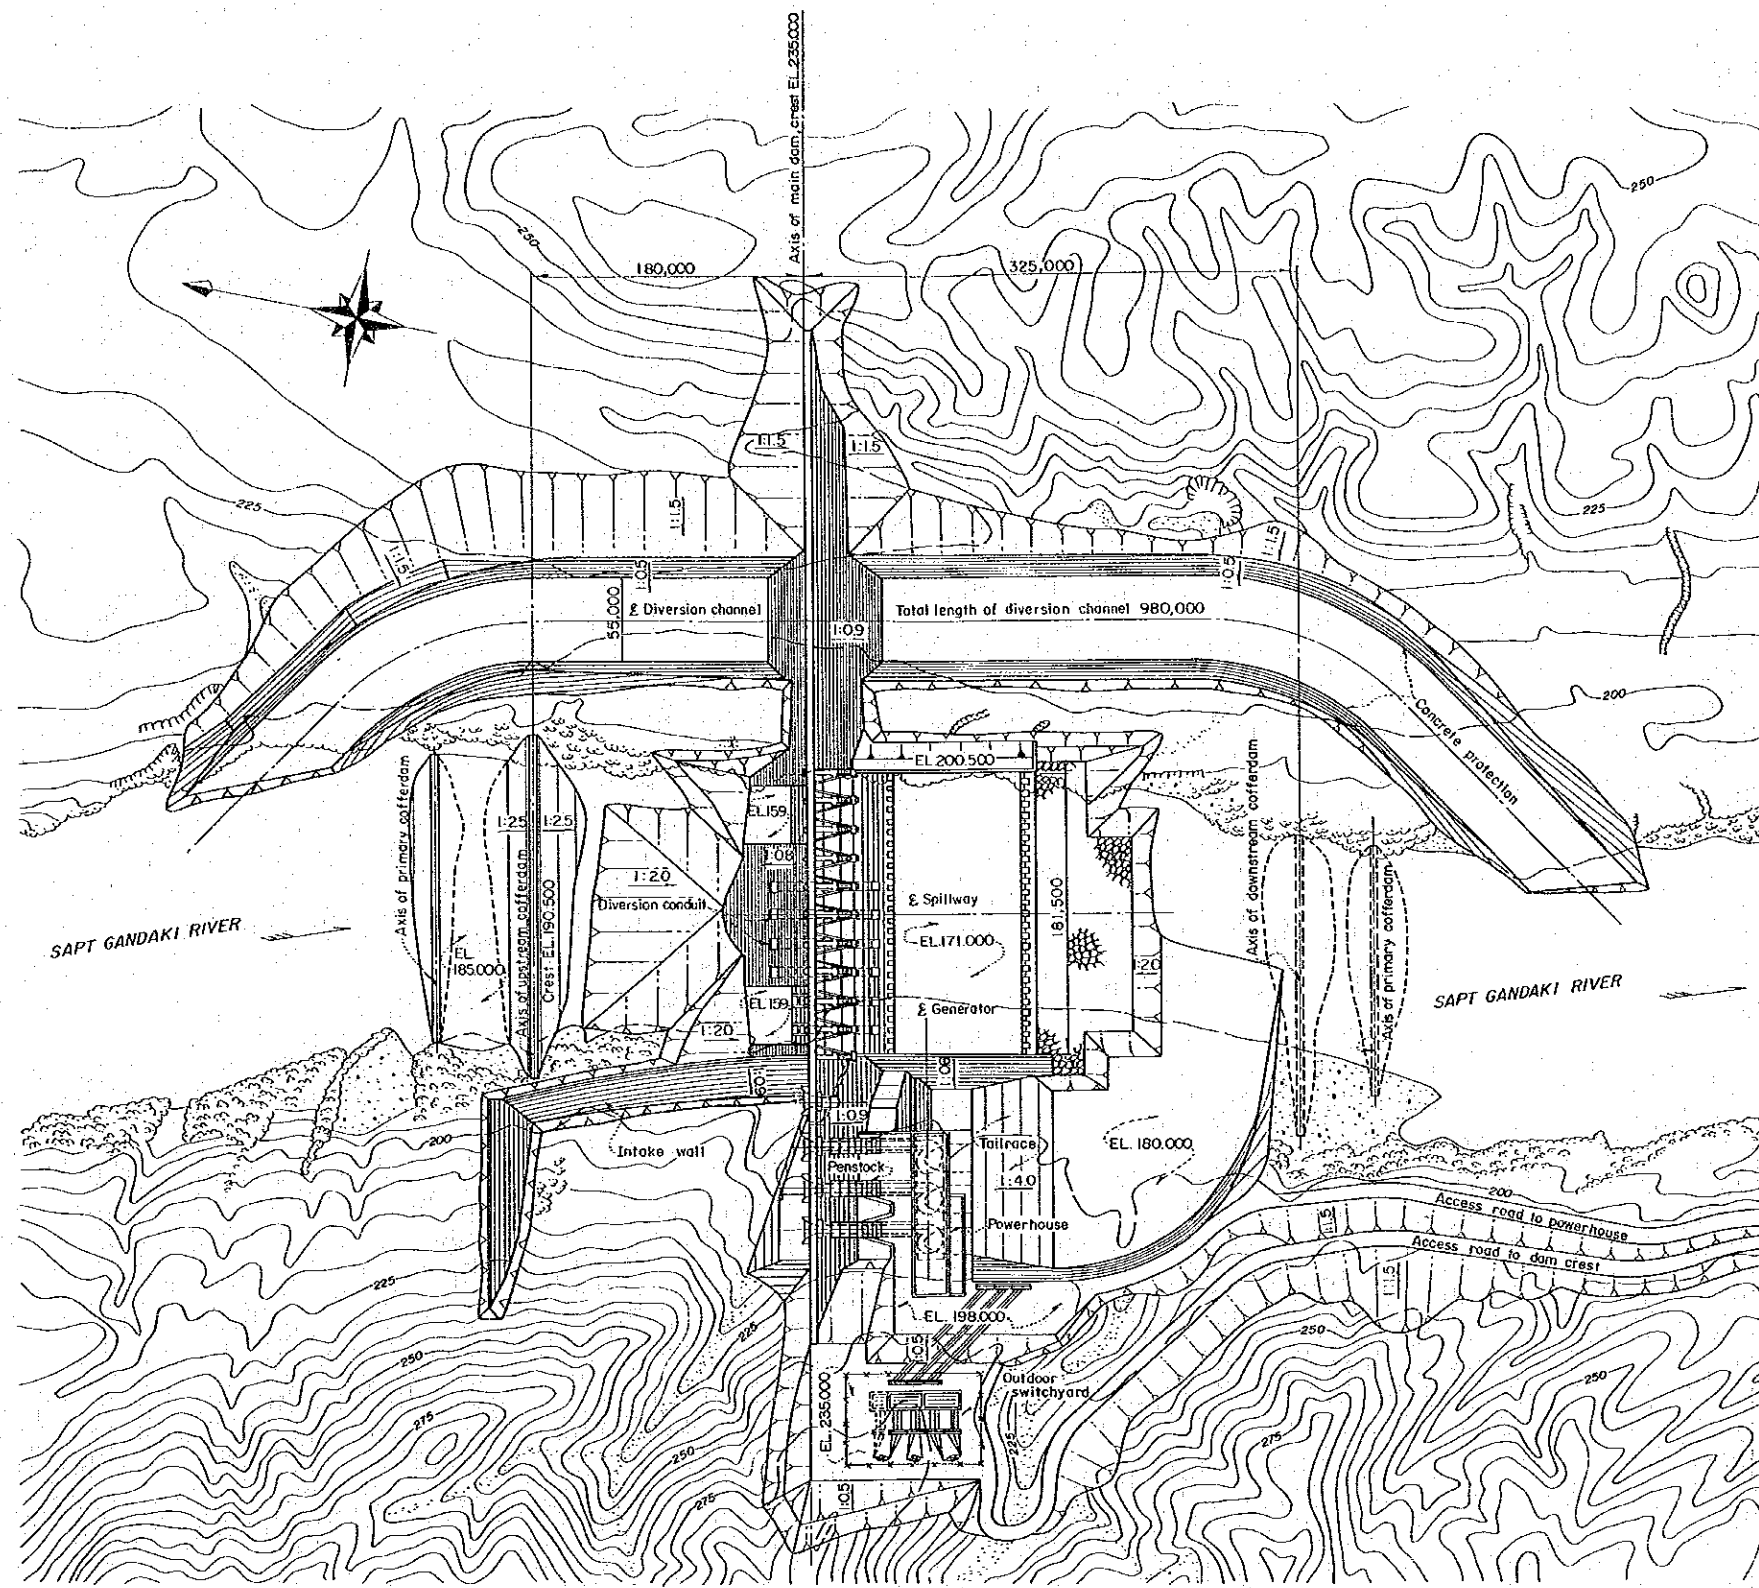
GENEPAL PLAN(SCHEME : GRAVITY DAM, DAMSITE-B, F.S.L 230, 225MW INSTALLED CAPACITY)
